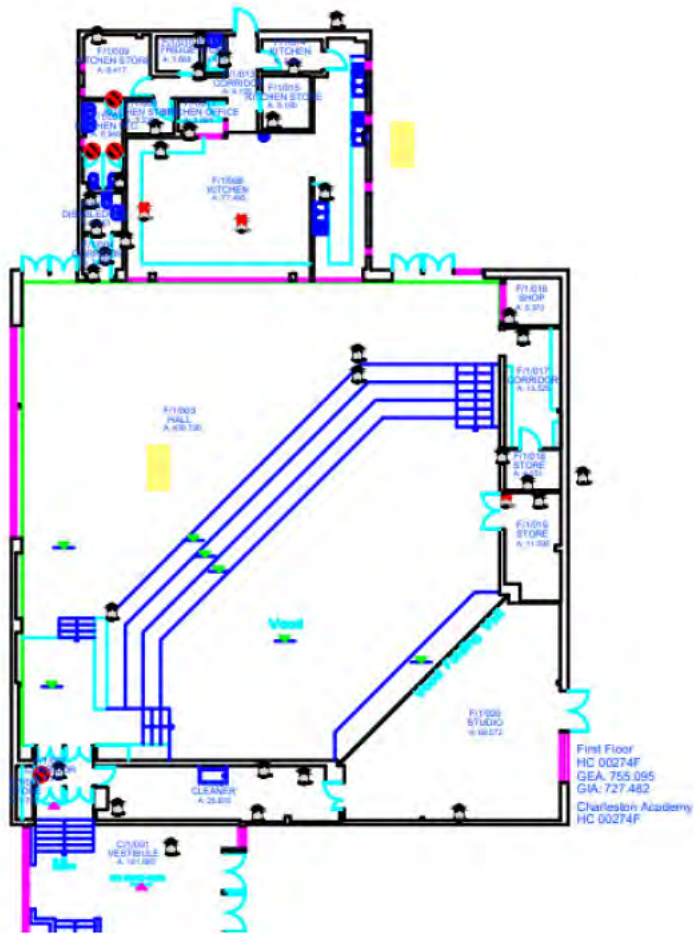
Assembly Hall/Kitchen/Store Layout
